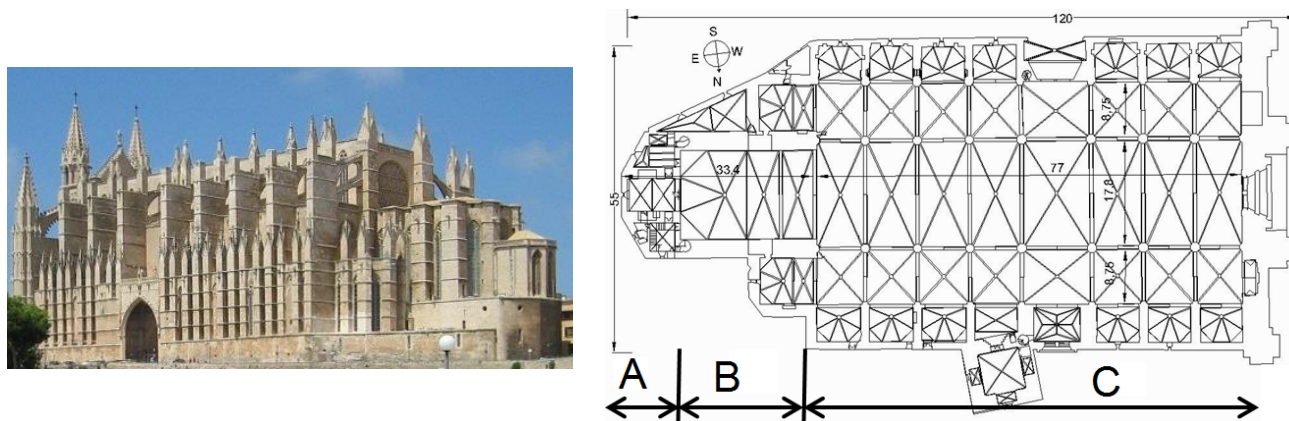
General view of Mallorca cathedral showing south facade and apse (left) and plan view (right).
